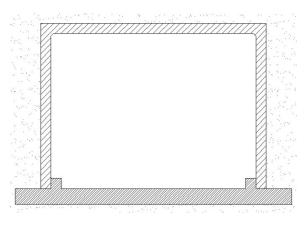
H(2) - PRECAST ARCH OVERPASS COMPLETE
